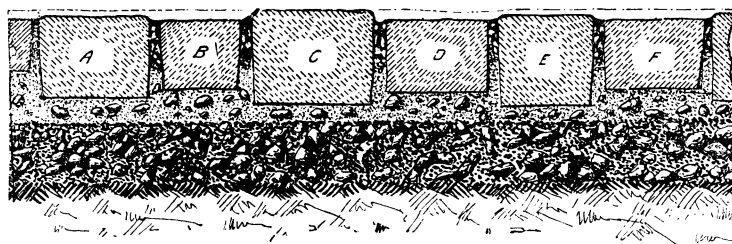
PAVEMENT AFTER HEAVY TRAFFIC.
